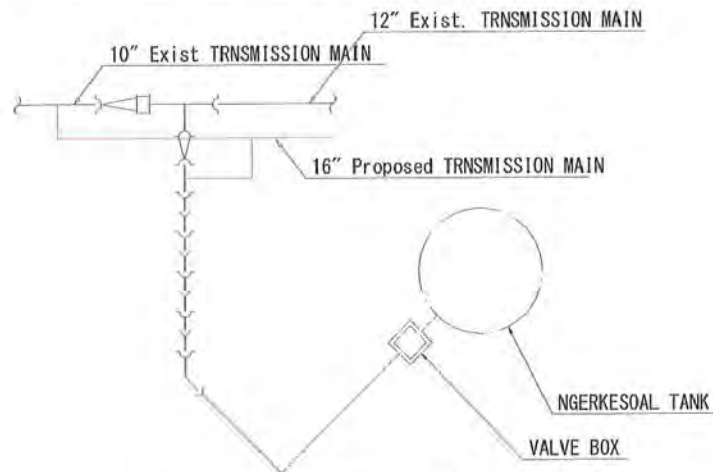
Proposed Connections to Ngerkesoal Service Tank
